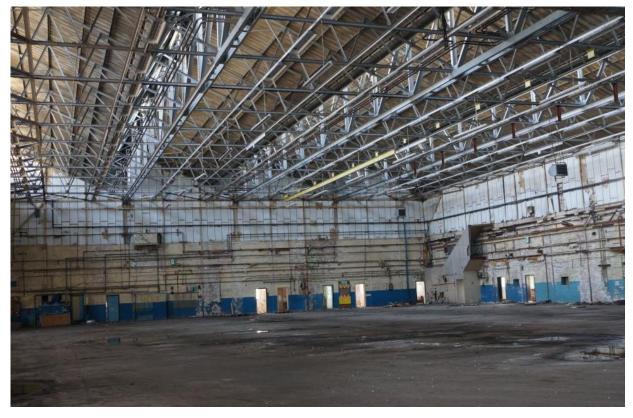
Flight Shed No.1 – interior looking towards the smaller section of the shed at the west end wall
